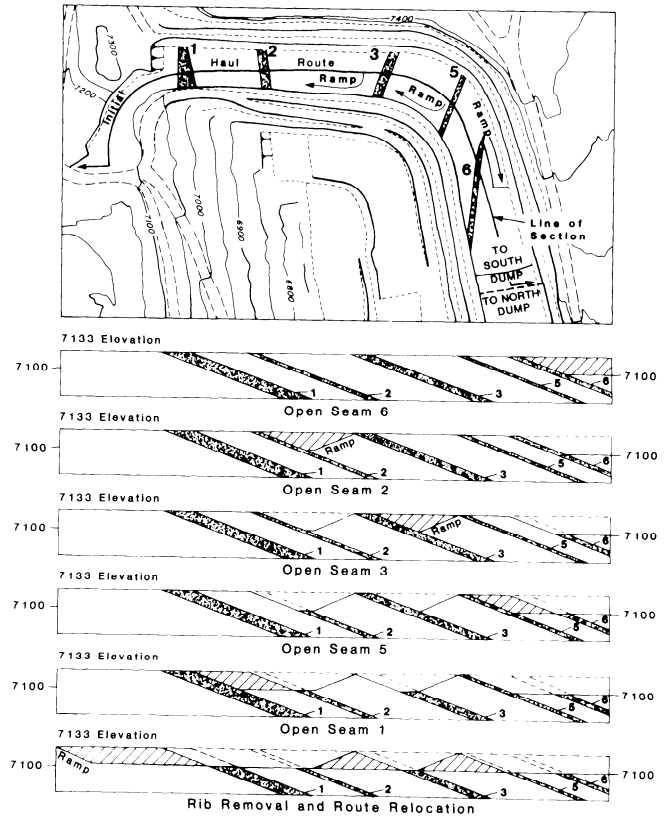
Bench development for the south wingwall, 1-UD pit.
